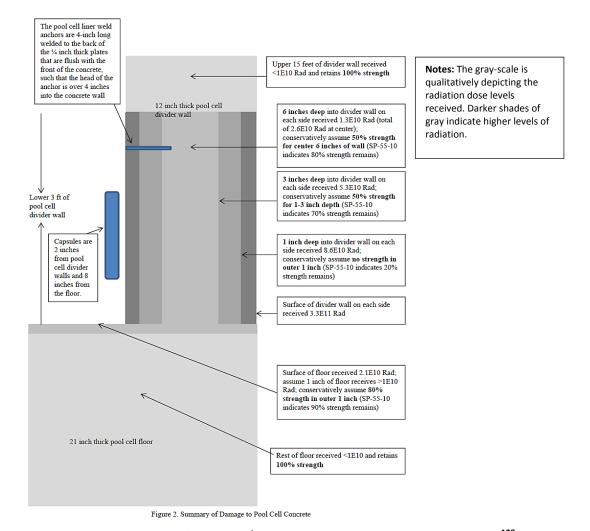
Summary of Assumed/Calculated Damage to Pool Cell Concrete¹²⁸
